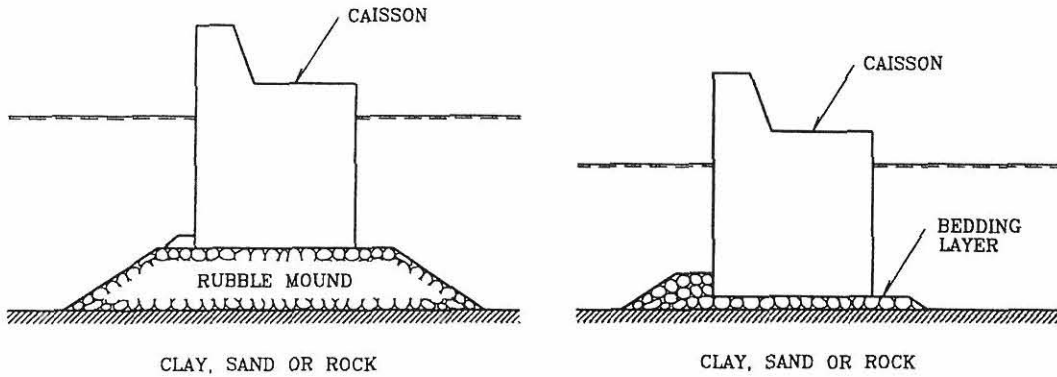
a,b Caisson breakwater on high rubble foundation and on bedding layer.
